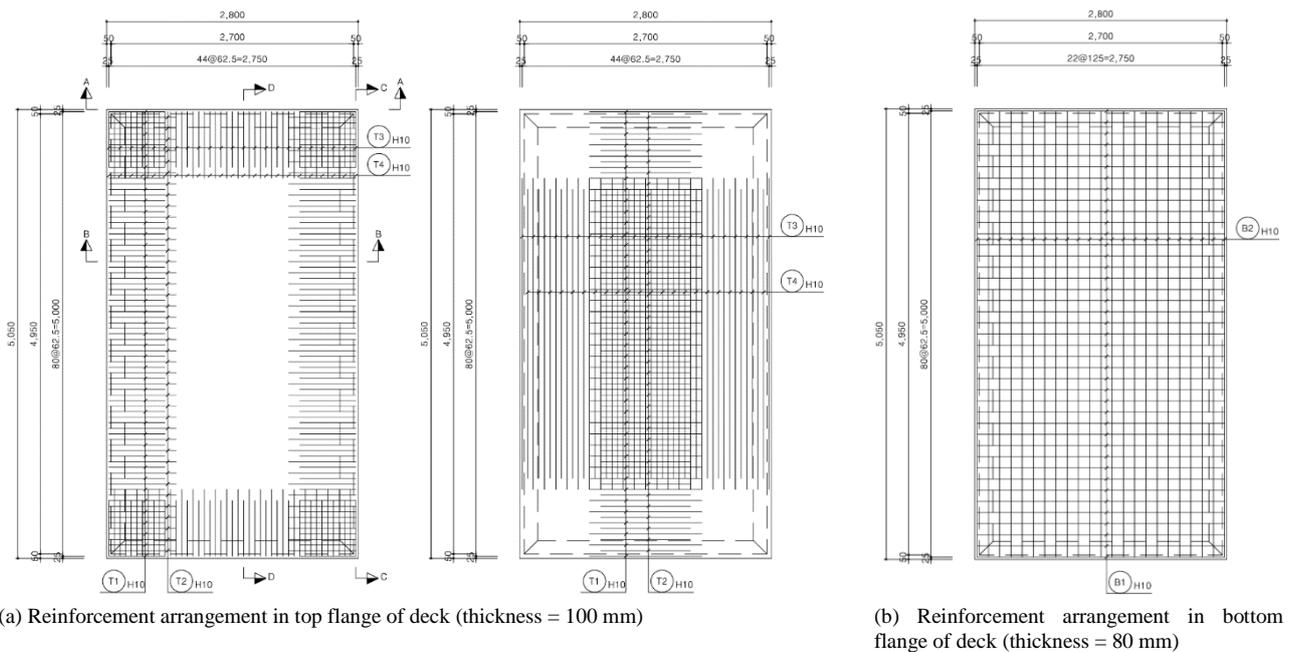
Arrangement of reinforcement at top and bottom flanges of deck specimen
